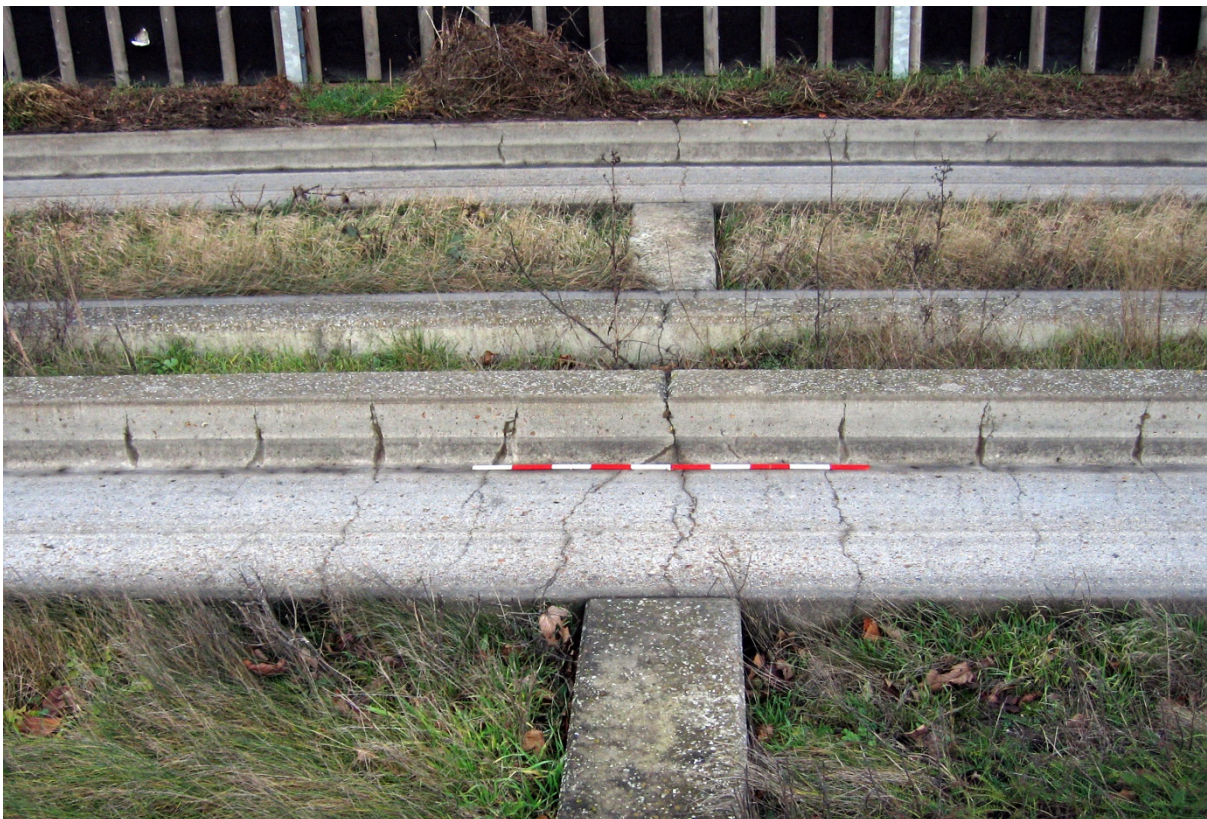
Centre of guide rail, showing V-notch and cracking. Scale bar: 1m.
